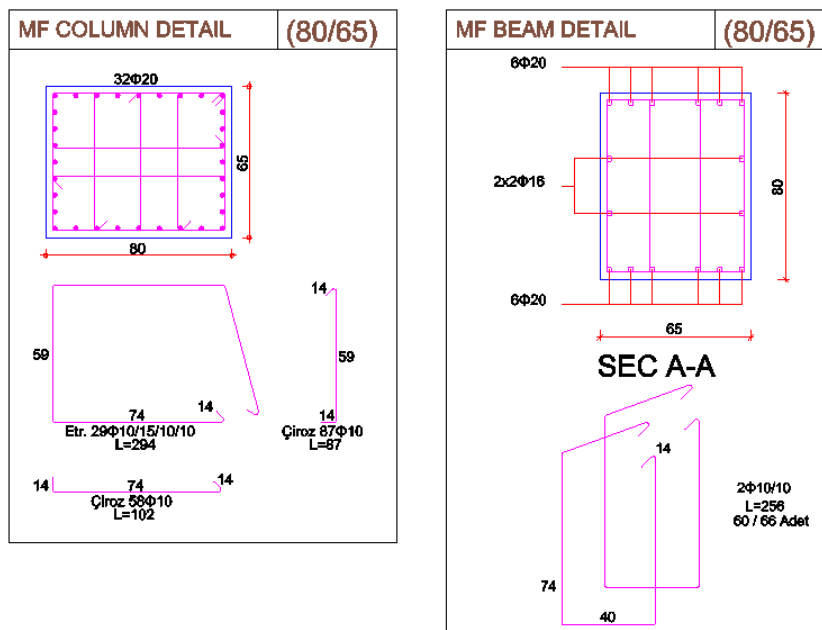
MaSTER FRAME® Column and Beam Section Plan
